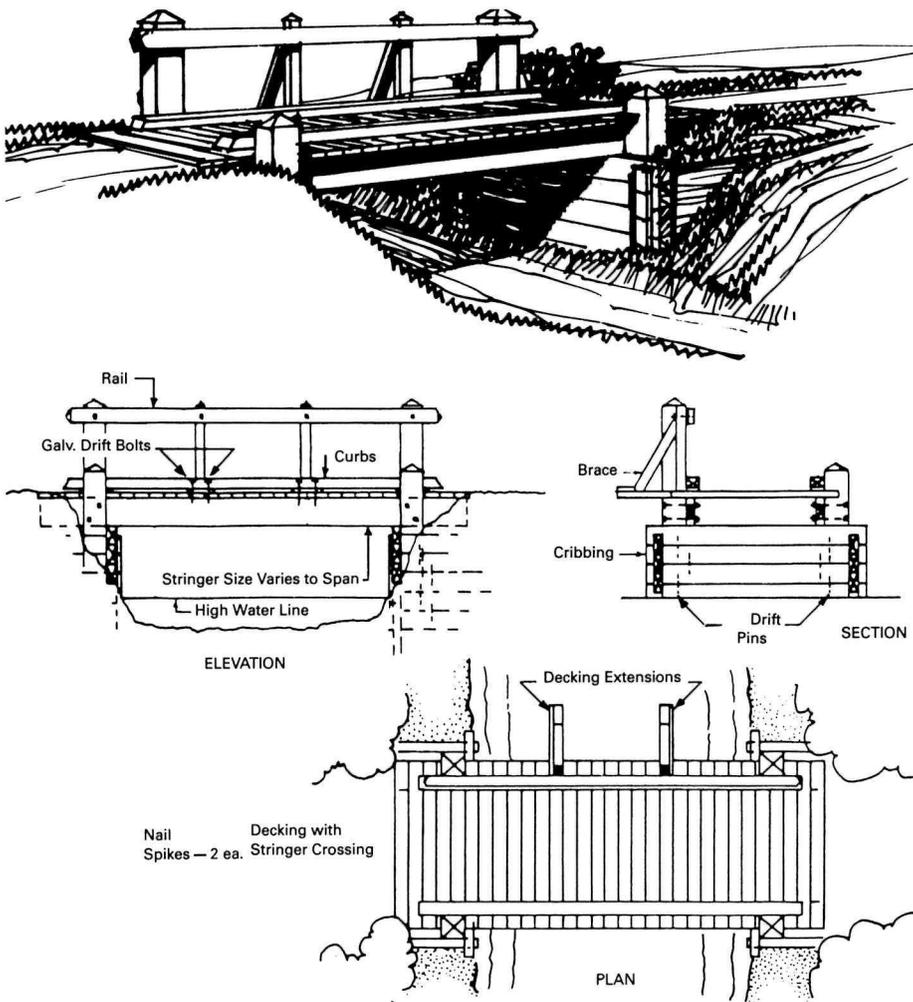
Although dimensioned lumber is shown, this basic design can be adapted to log construction and the span and abutment design to local site conditions. (Design by USFS).
